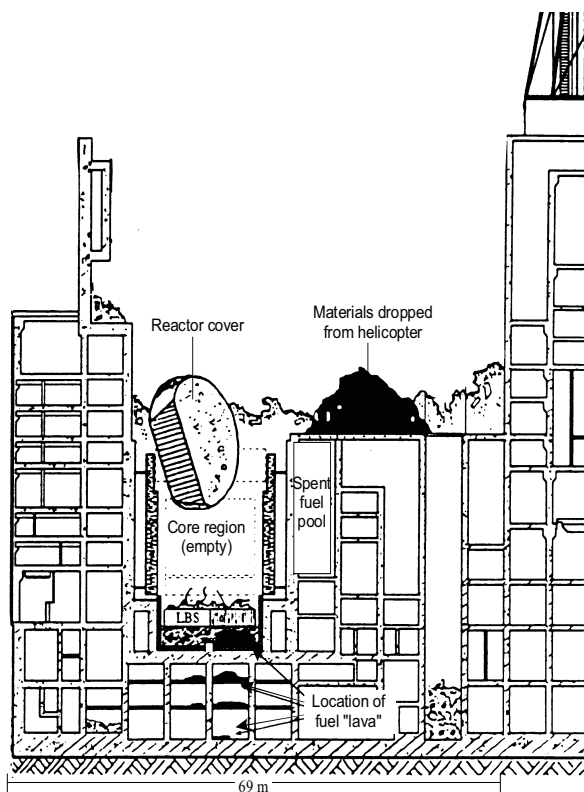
Figure I. Cross-section view of damaged Unit 4 Chernobyl reactor building.
